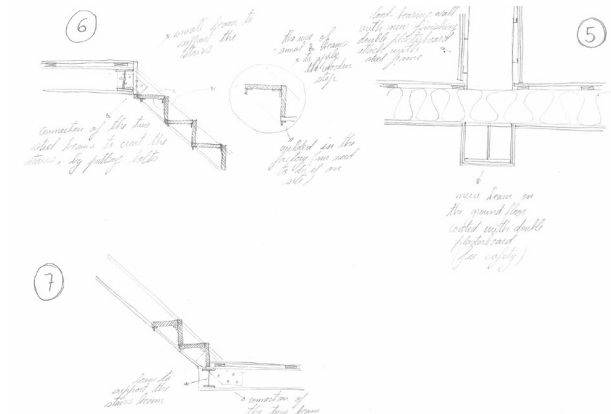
Sketches: Connections of the new front entrance and key point of the beam to support the walls in the ground floor
